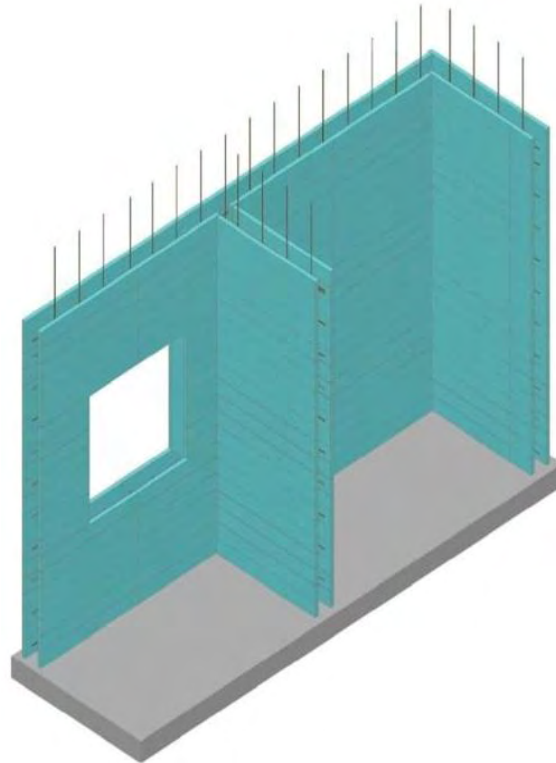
Horizontal reinforcement bars      Fig. 41 Vertical reinforcement bars
